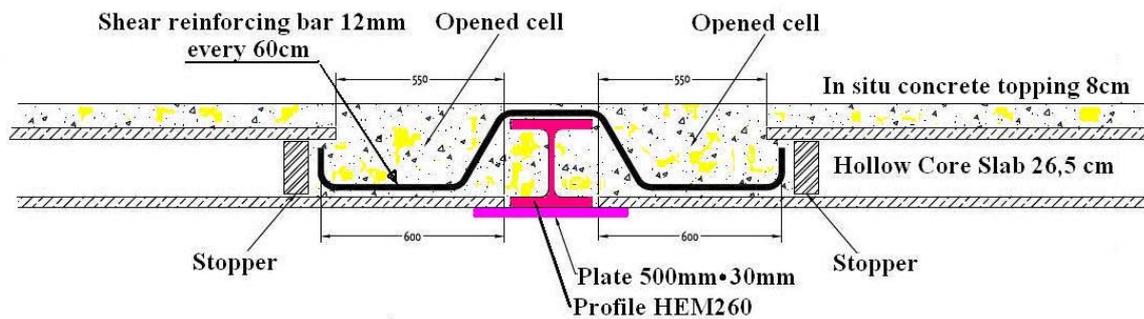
How to connect hollow core slabs to slim floor beams; the necessity of opening cells according to figure 46
